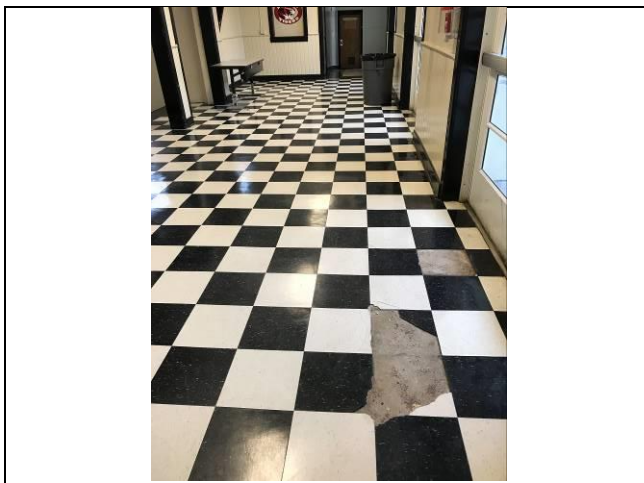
View of damaged vinyl floor tile in old gym lobby.
